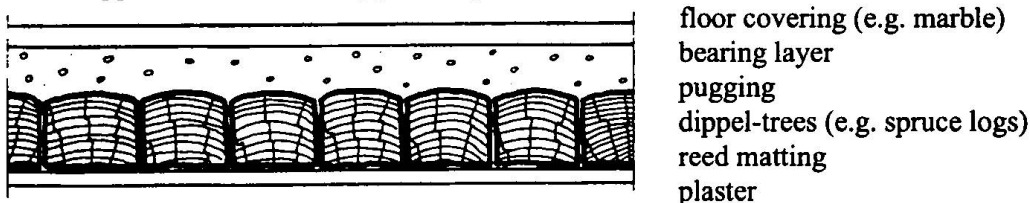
'Dippelbaumdecke' - 'Dippel-tree floor'
